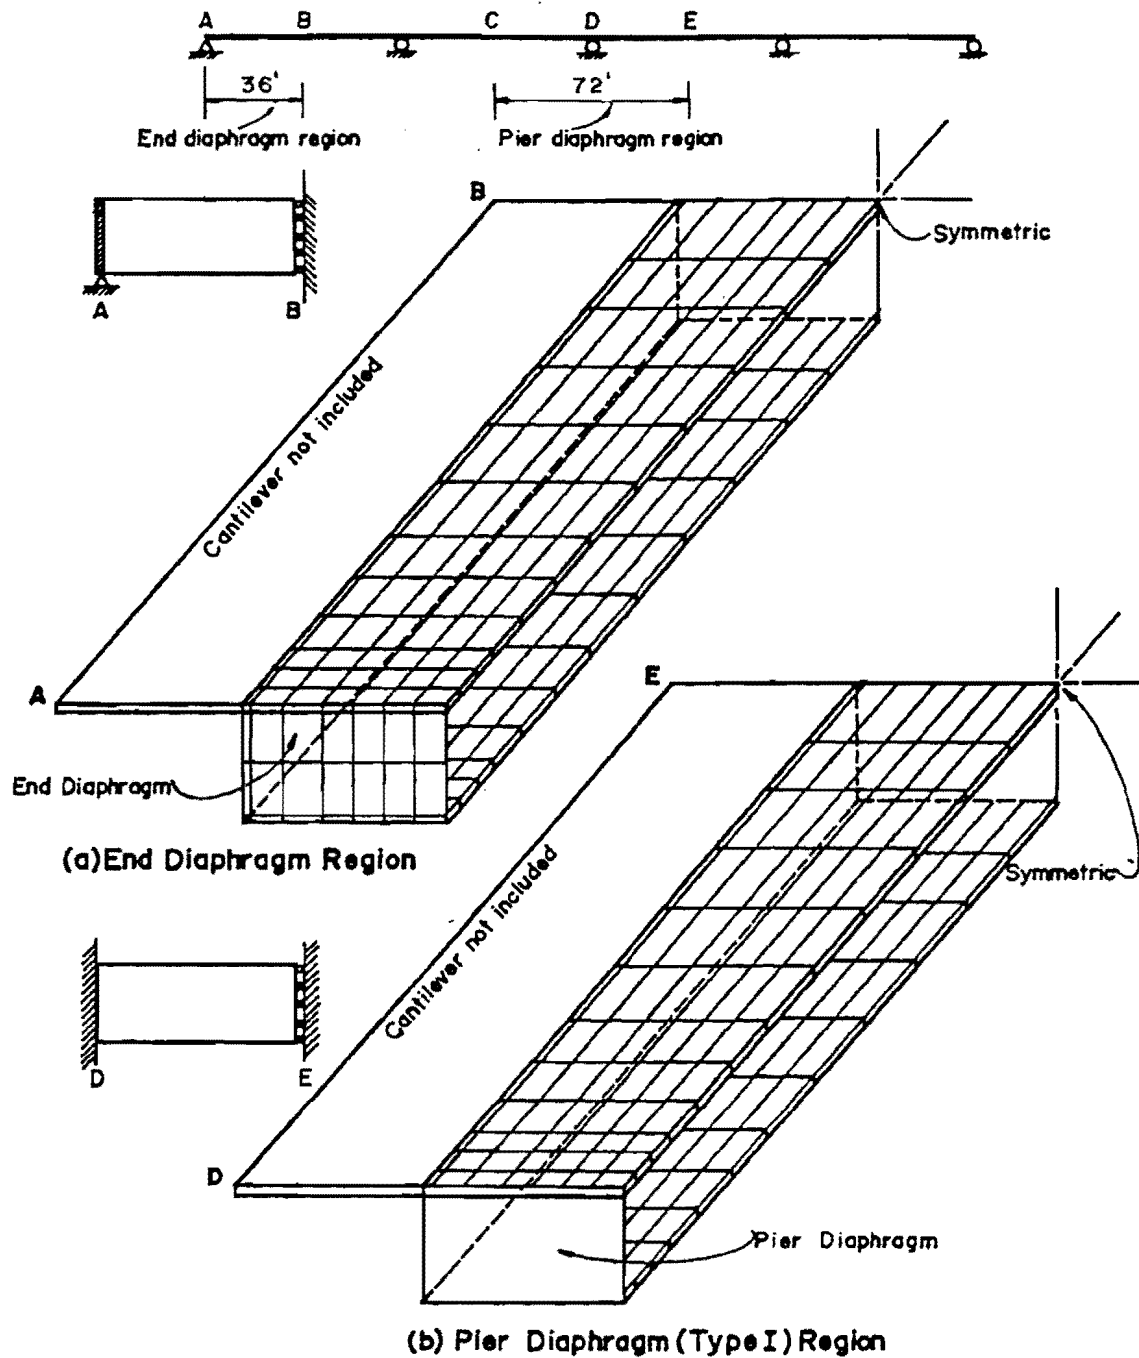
1-cell box girder bridge: F.E. idealization of end- and pier-diaphragm regions
